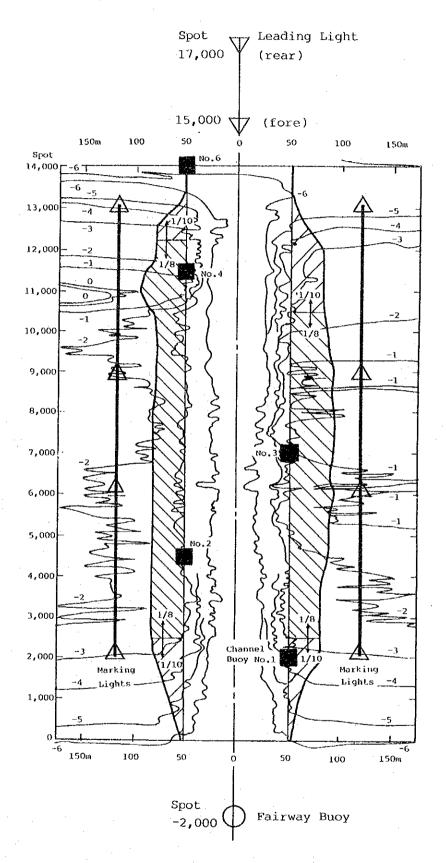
Arrangement of Navigational Aids (Comprehensive Plan)
